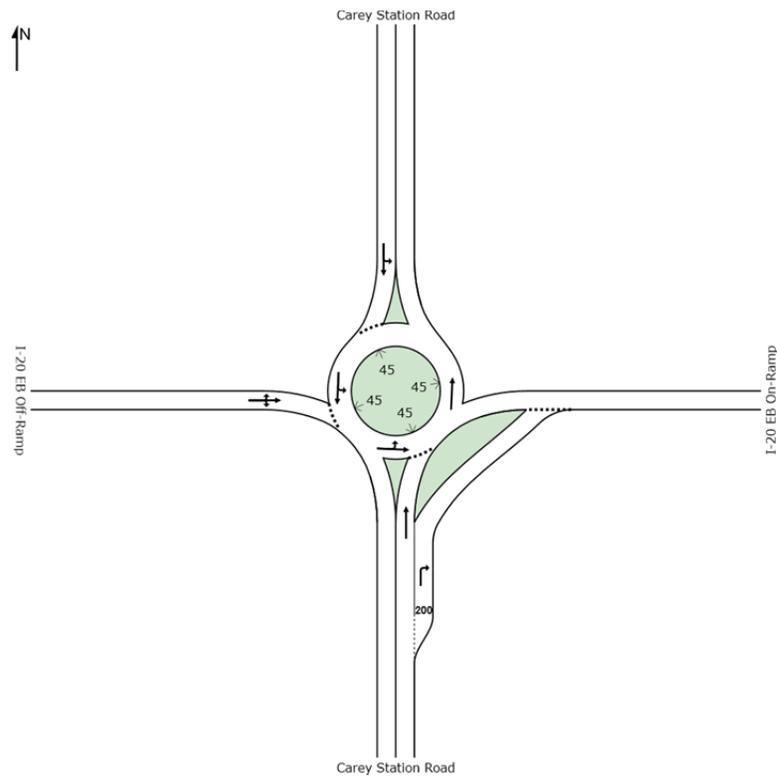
Single Lane Roundabout with Partial Right Turn Bypass I-20 Eastbound Ramps at Carey Station Road
